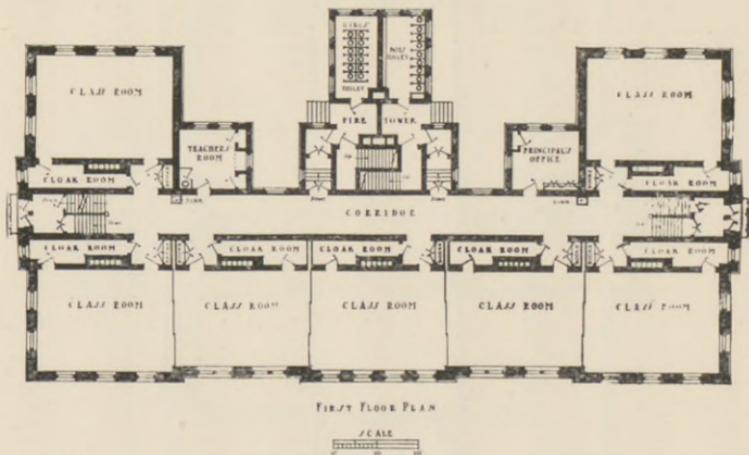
Types of school buildings of Philadelphia. Plan of type of 1890.
